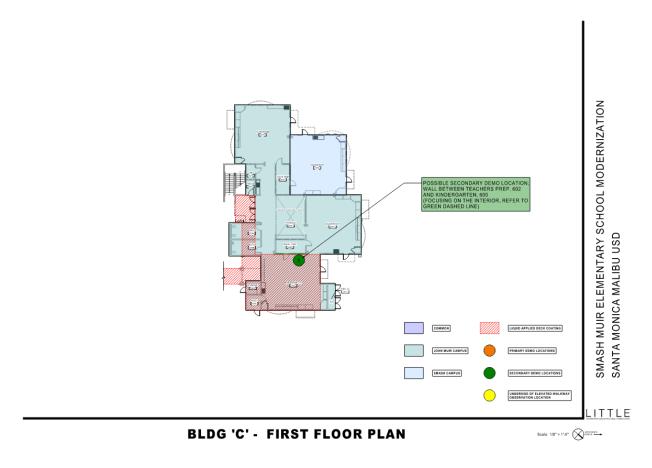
Demo Locations, Bldg C_First Floor Plan_Demo Locations.
